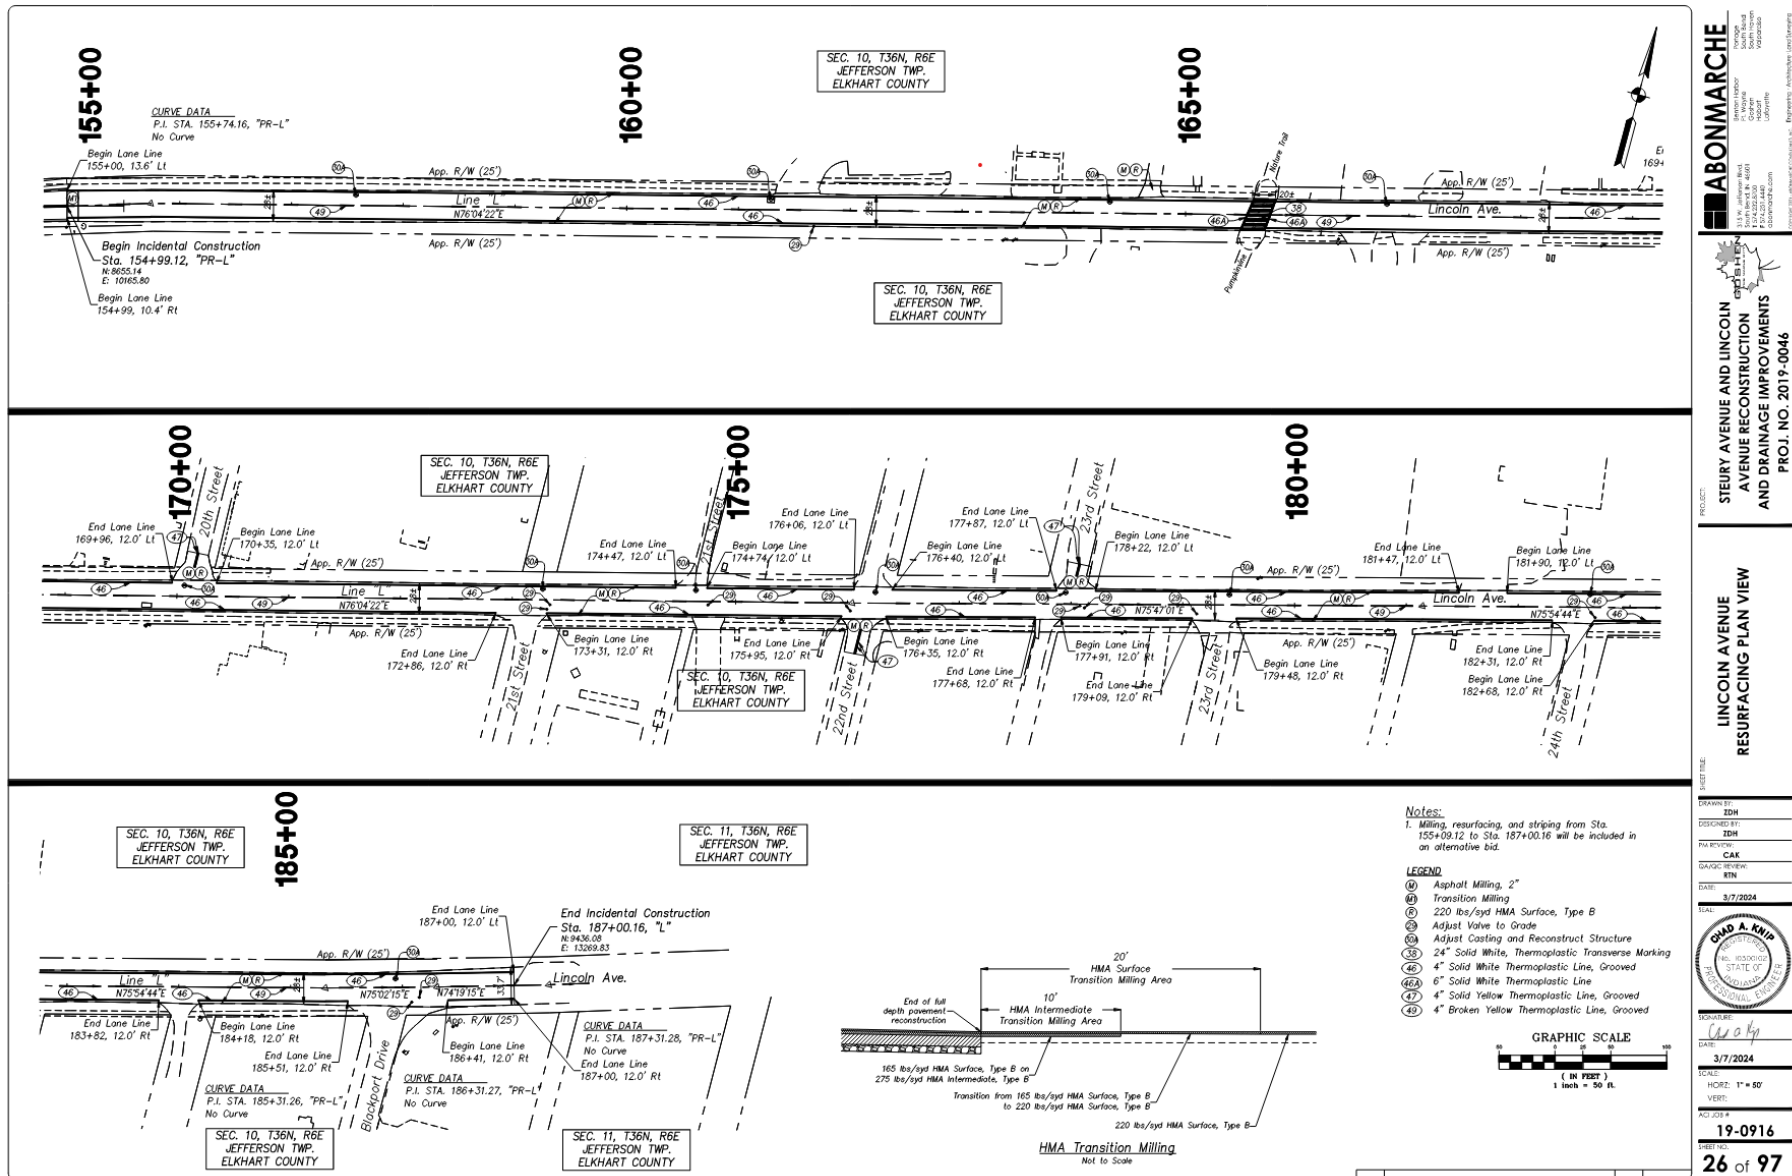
East Lincoln Avenue Mill and Overlay Limits – Area for Pavement Interlayer
